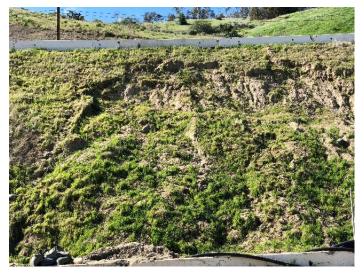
Access Road Slope near Terminal Basin Entrance: March 29, 2018
